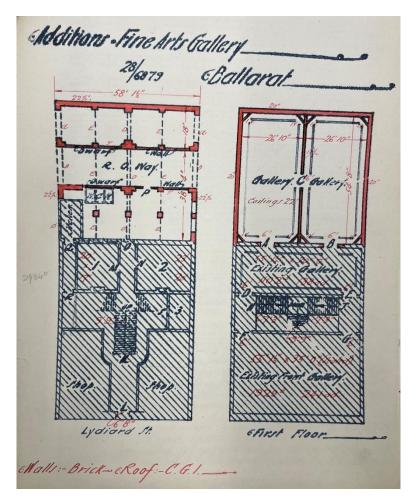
1928 ground and first floor proposed plans by Clegg, Morrow and Cameron showing the addition of the upper level gallery spaces to the rear of the original building Source: Public Building File, VPRS 7882/P0001, Public Record Office Victoria
